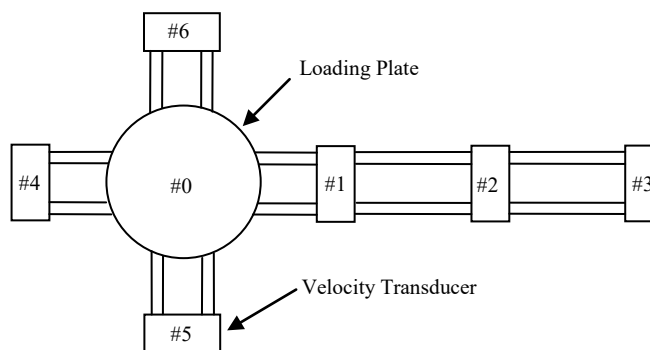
Schematic. Additional FWD testing sensor layout for parking lots.
